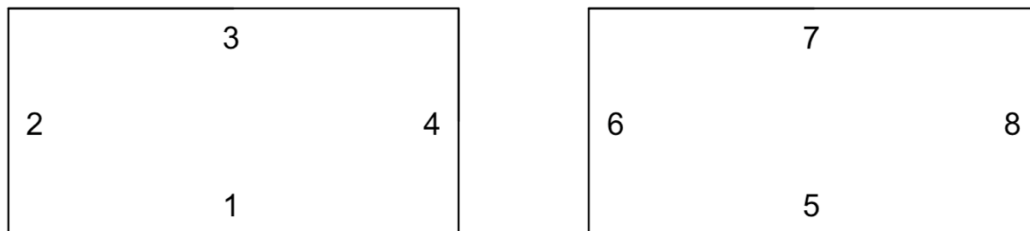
Plan View; i Assembly Tags of Walls (left) and Windows (right)
